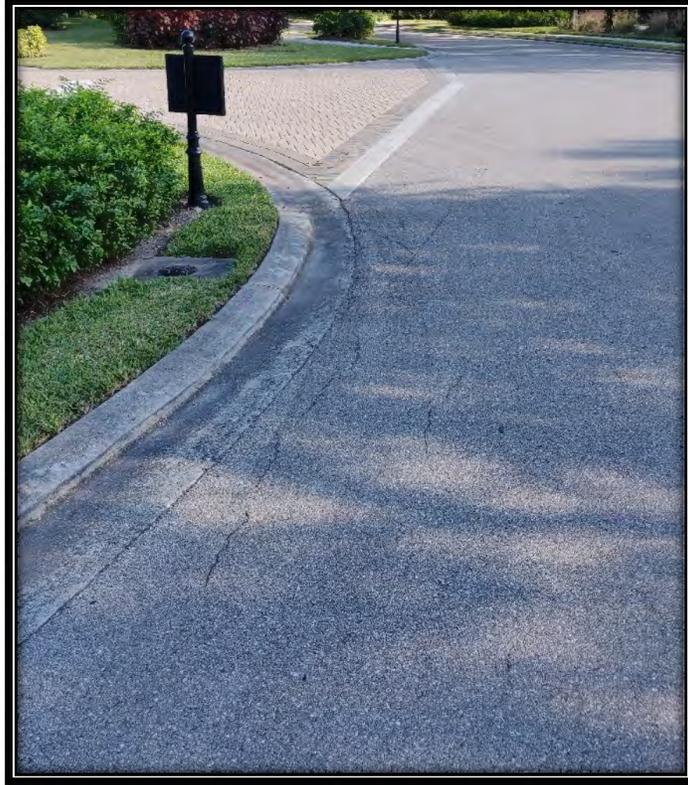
Slight cracks in pavement at entrance to Torrey Pines Way
